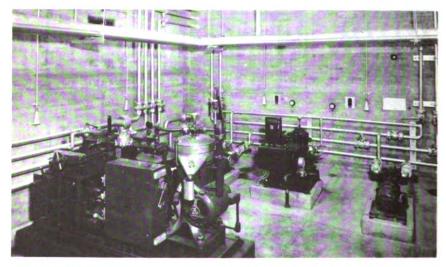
CO2 fire protection outlets on wall of oil purification room—Fontana.
